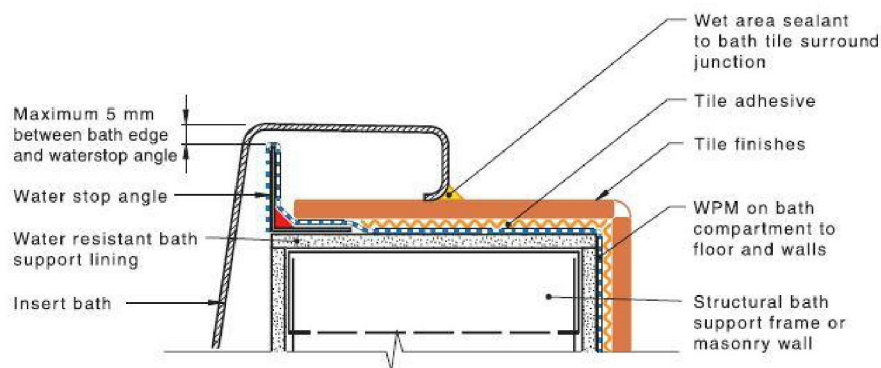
(E) — Shower over bath — Insert bath — Bath compartment wall
